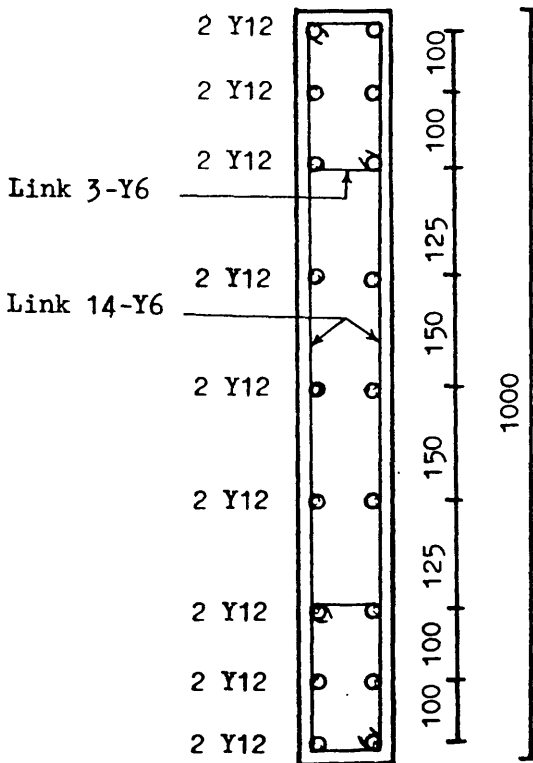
A horizontal section in the wall of Models MS7, MS8 and MS9 showing the reinforcing details
